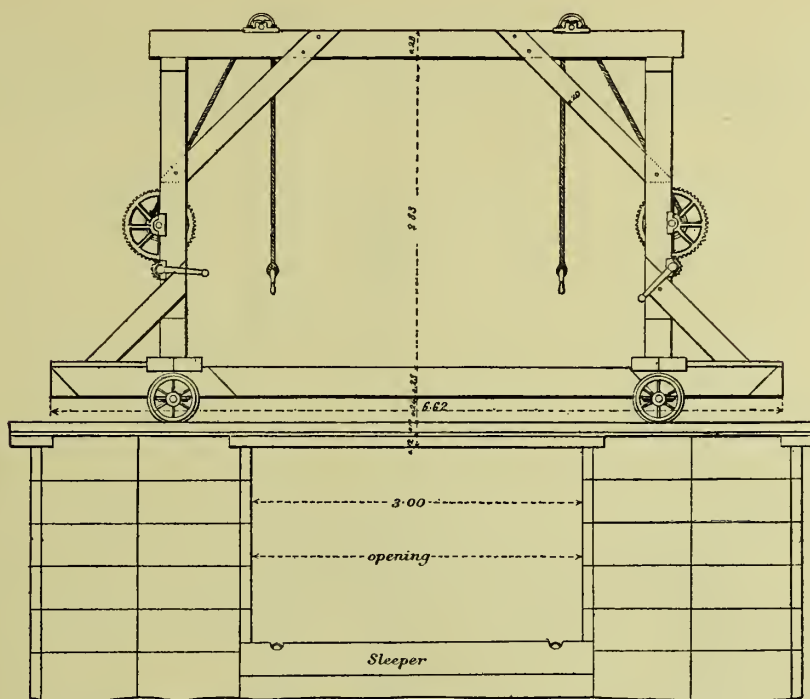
Travelling Carriage for Horizontal Sleepers. Front Elevation.
